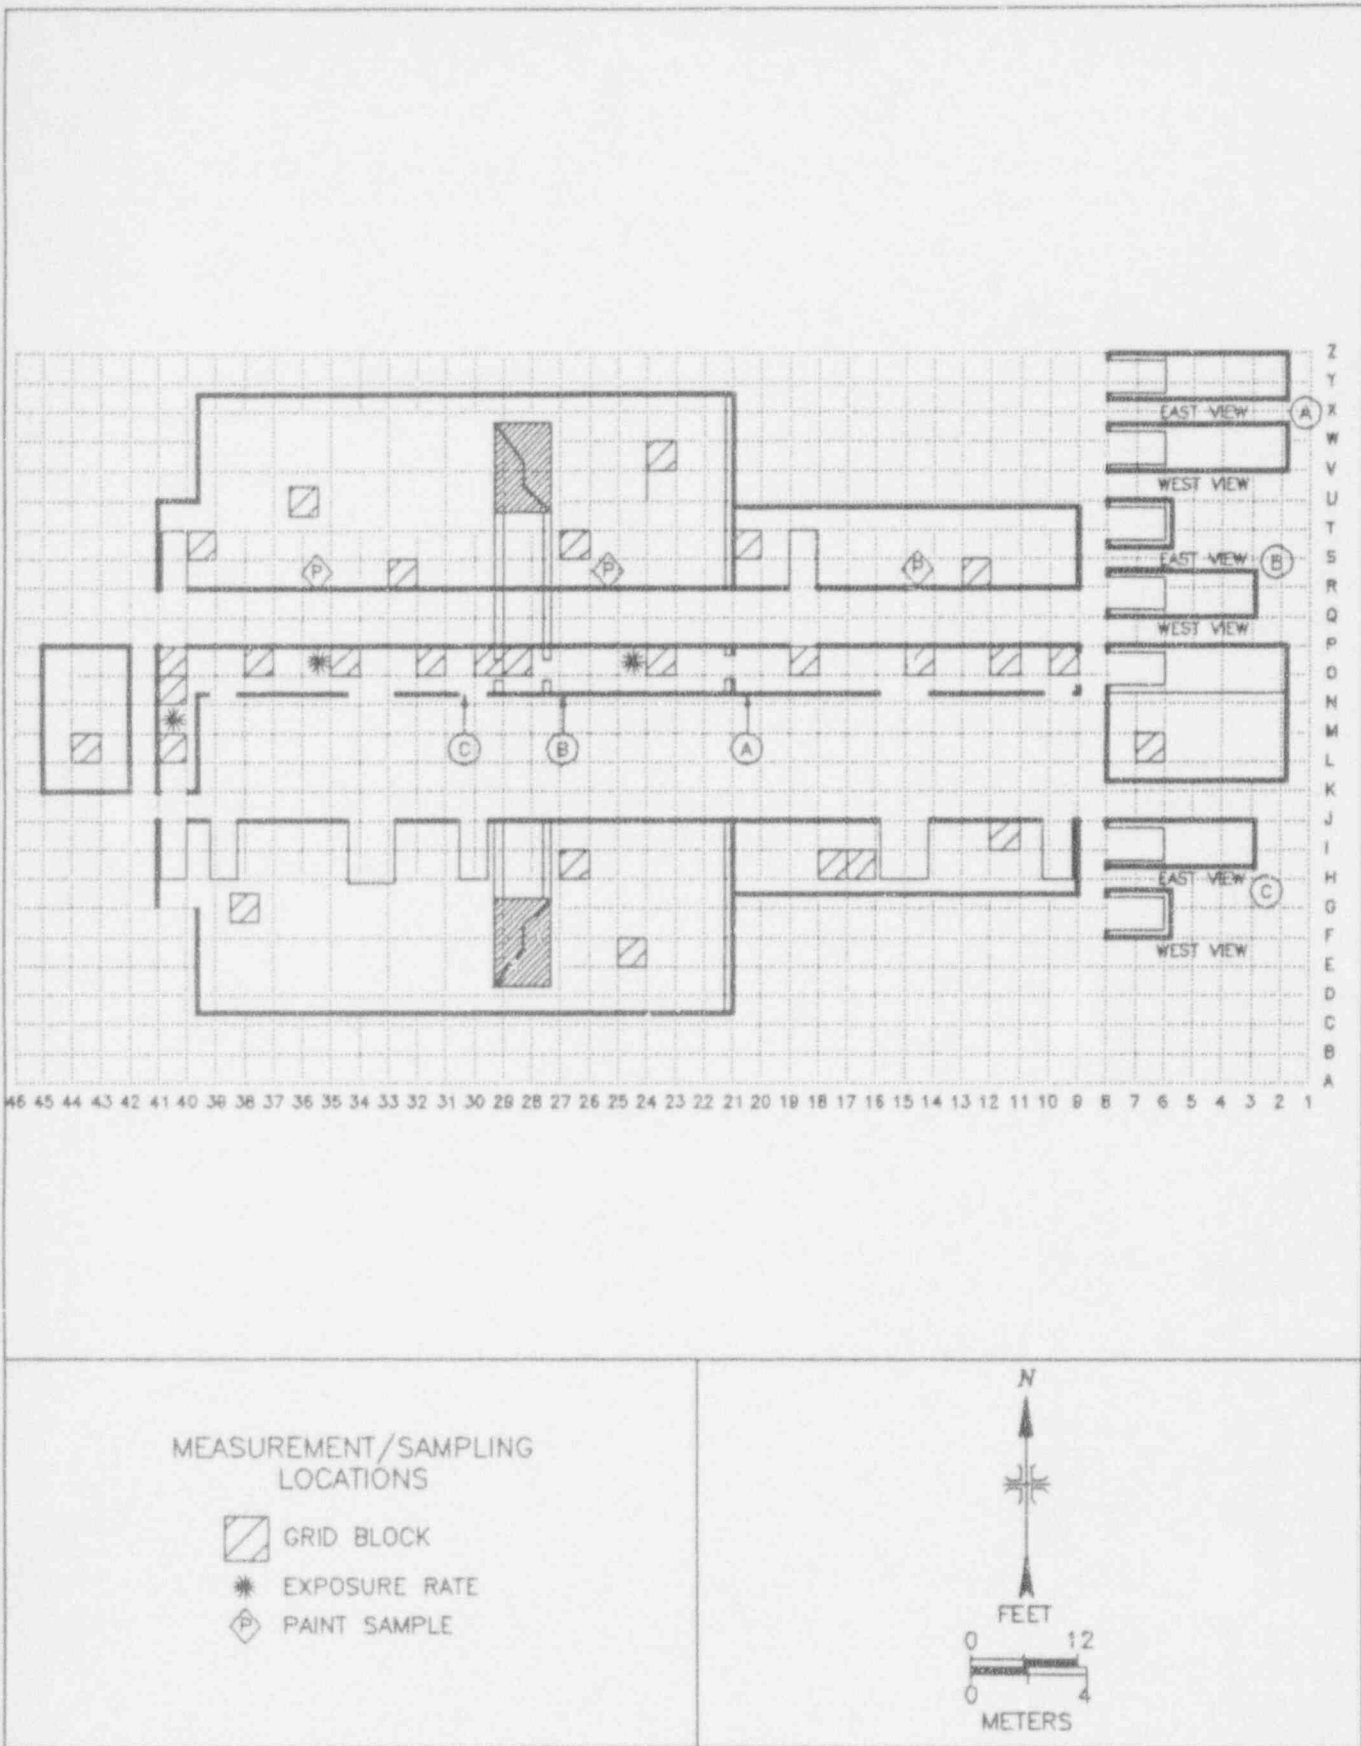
Units 1 and 2 Hallway, Lower Walls, Floor and Upper Walls - Measurement and Sampling Locations
